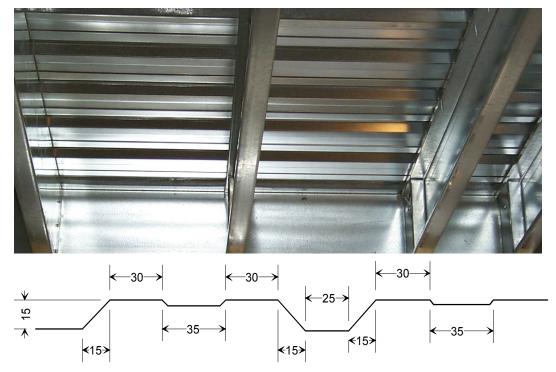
Steel C-joists and cross section of corrugated steel deck, thickness 0.41 mm.
